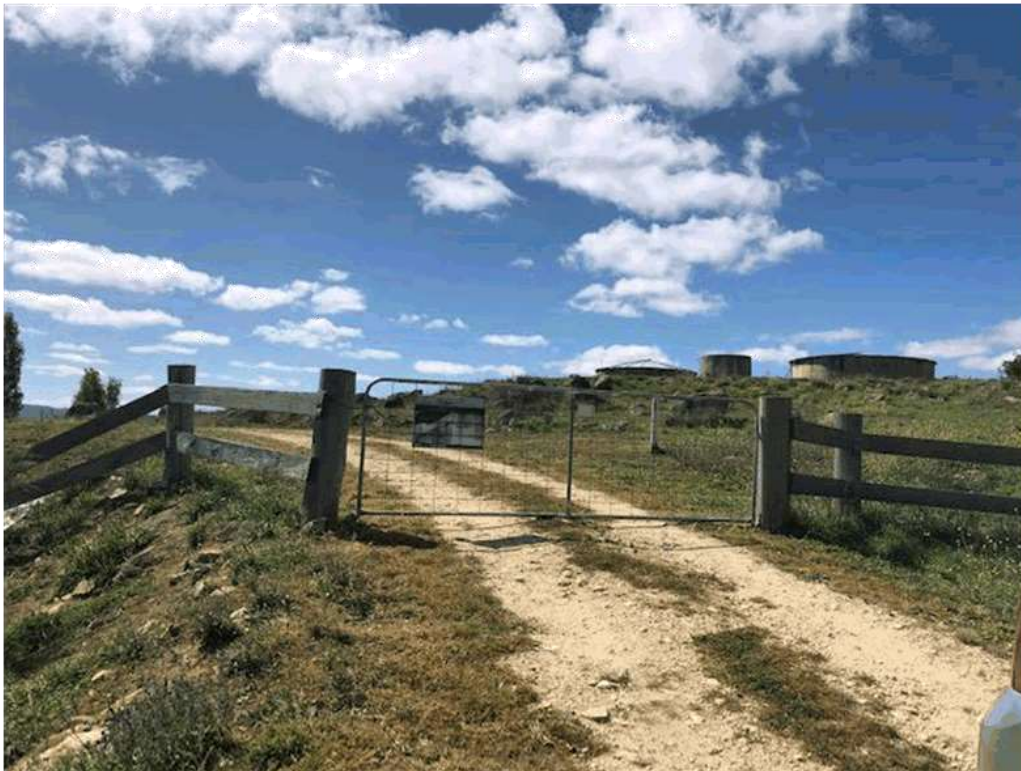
Access to the site off Charlottes Lane. The site is secured by a lockable gate.
